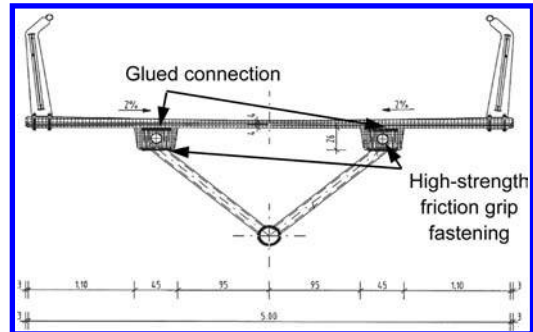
Cross-section of the Gaertnerplatz-Bridge.
